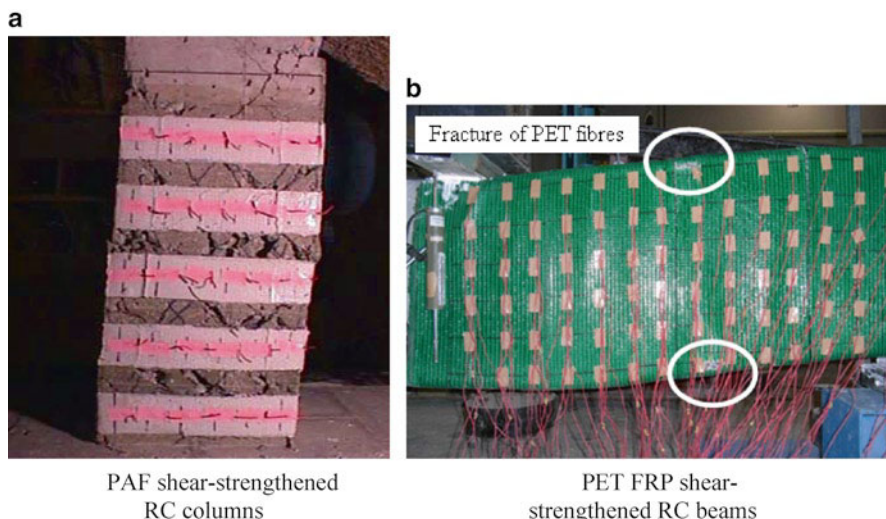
Shear failure of RC members wrapped with LRS FRP composites (a) PAF shear-strengthened RC columns (b) PET FRP shear- strengthened RC beams
